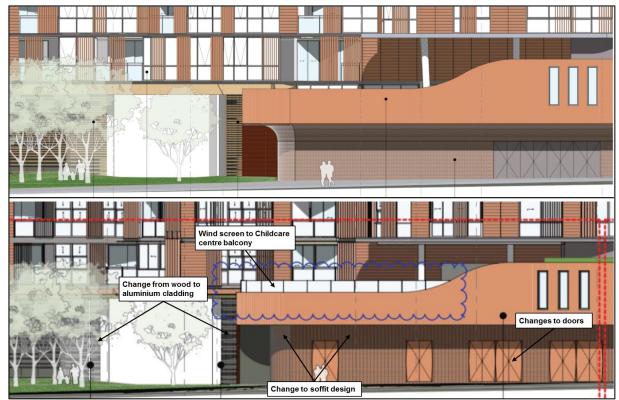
Approved (top) and modified (bottom) southern elevation fronting Wellington Street (Base source: Applicant's EIS)
